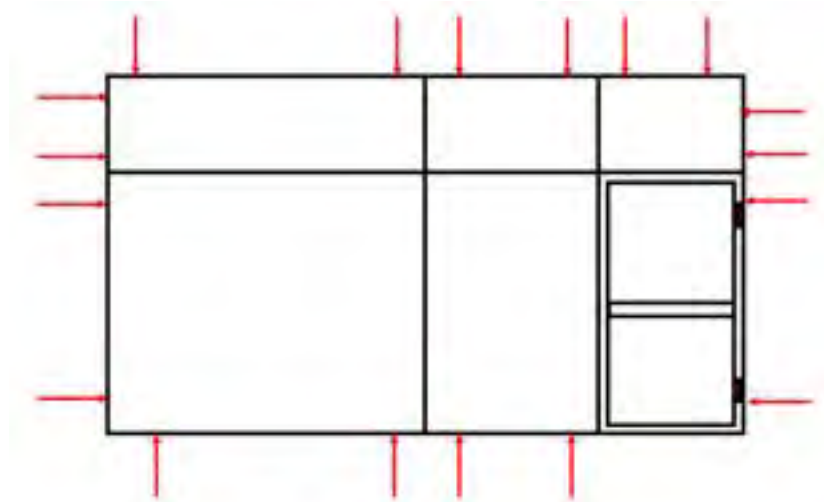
Points of fixing (Technical Manual of Windows Installation, POVAS 2019)
